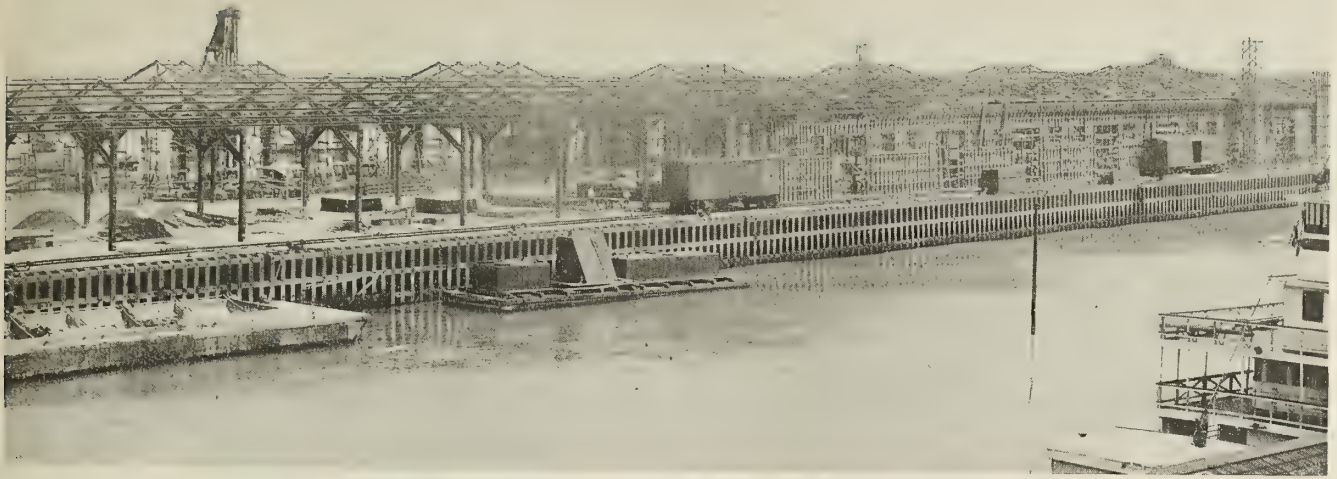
Steel Construction and Wood Bulkhead of a Pier Recently Erected
